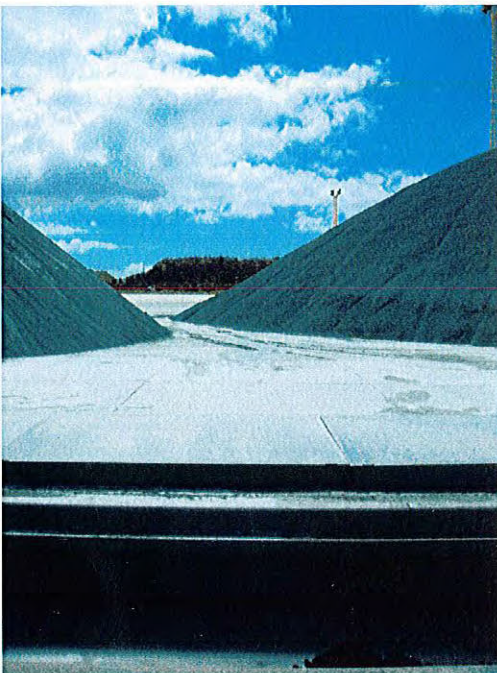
, fines and water from sand stockpile, seeping to coal conveyor trench
